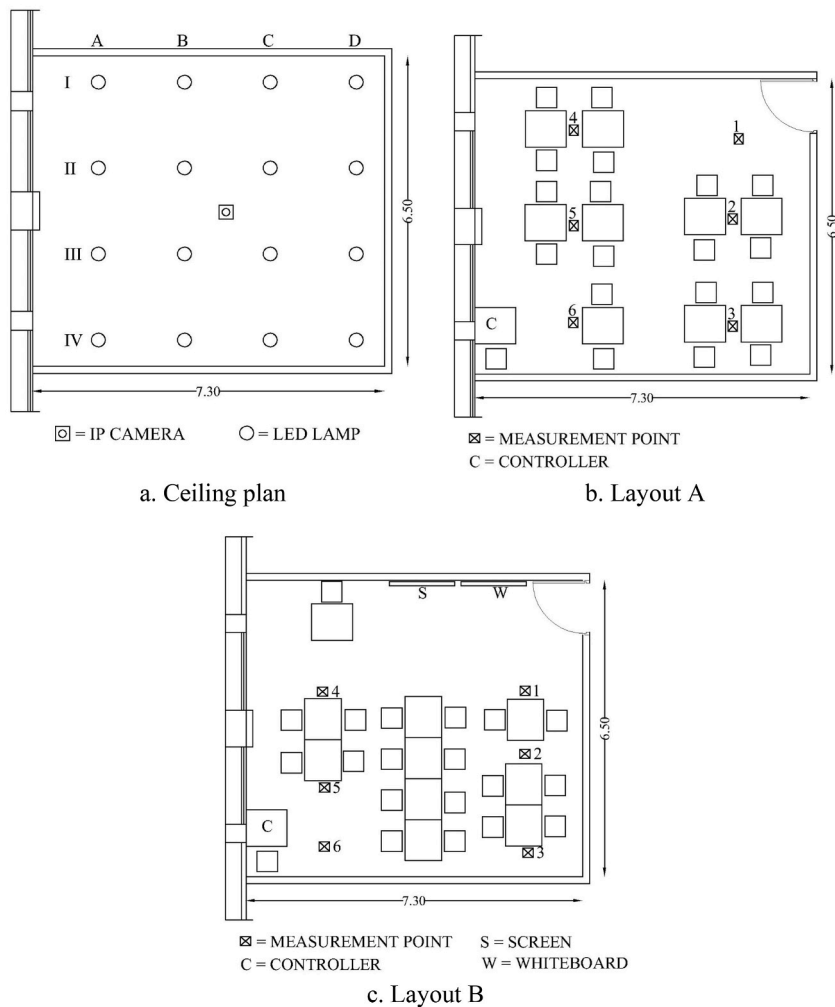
The ceiling plan (a) and classroom seating layout for group discussion and/or self-study (b) and for slideshow (c).
